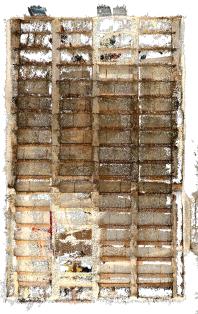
Southeast Isometric View, Model 13_InteriorKitchen&Closet
